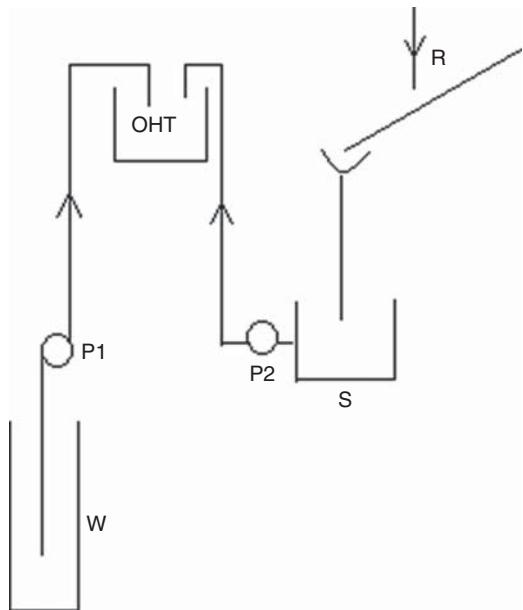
Plumbing configuration for RTRWHS – Scenario (b).
